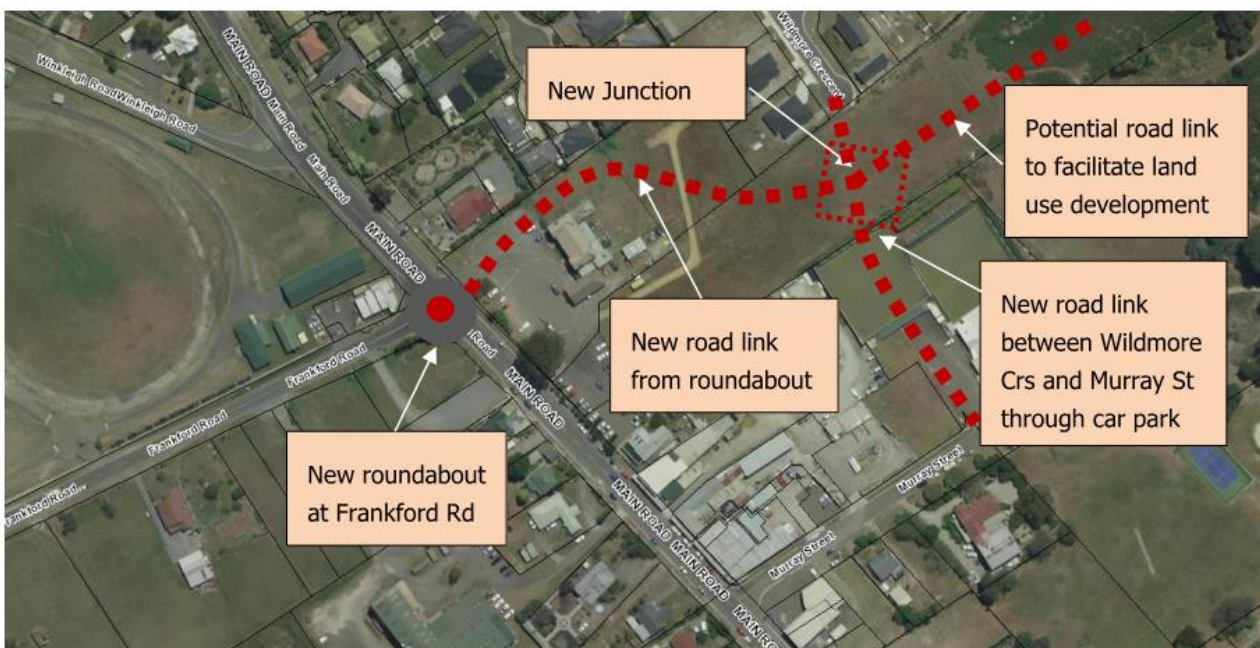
Indicative Murray Street to Wildmore Crescent link via Frankford Road junction
